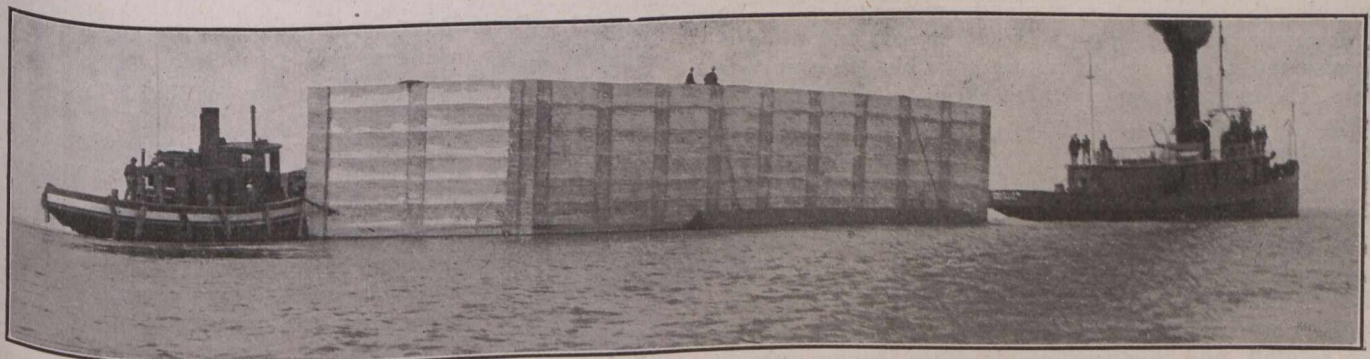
Completed Crib Being Towed to Port Weller Harbor Site.
